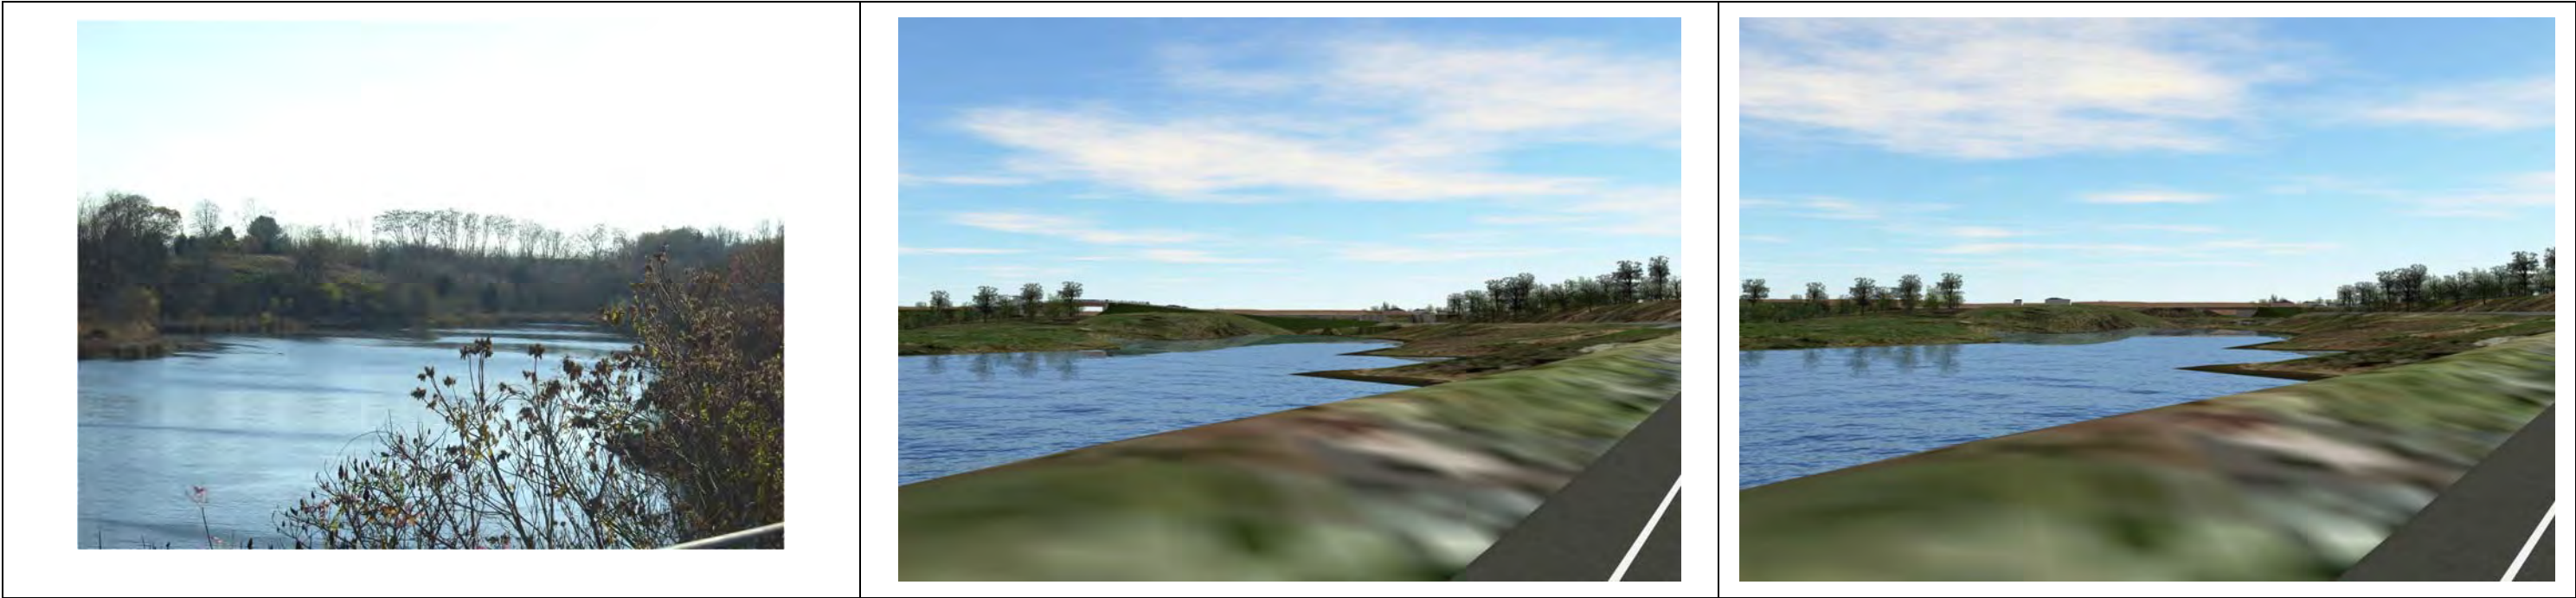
View from Clarksburg Road (MD 121), looking south across reservoir. Left: Site photo looking south. Middle: Alternative 1 highway bridge, looking south. Right: Alternative 2, looking south.
